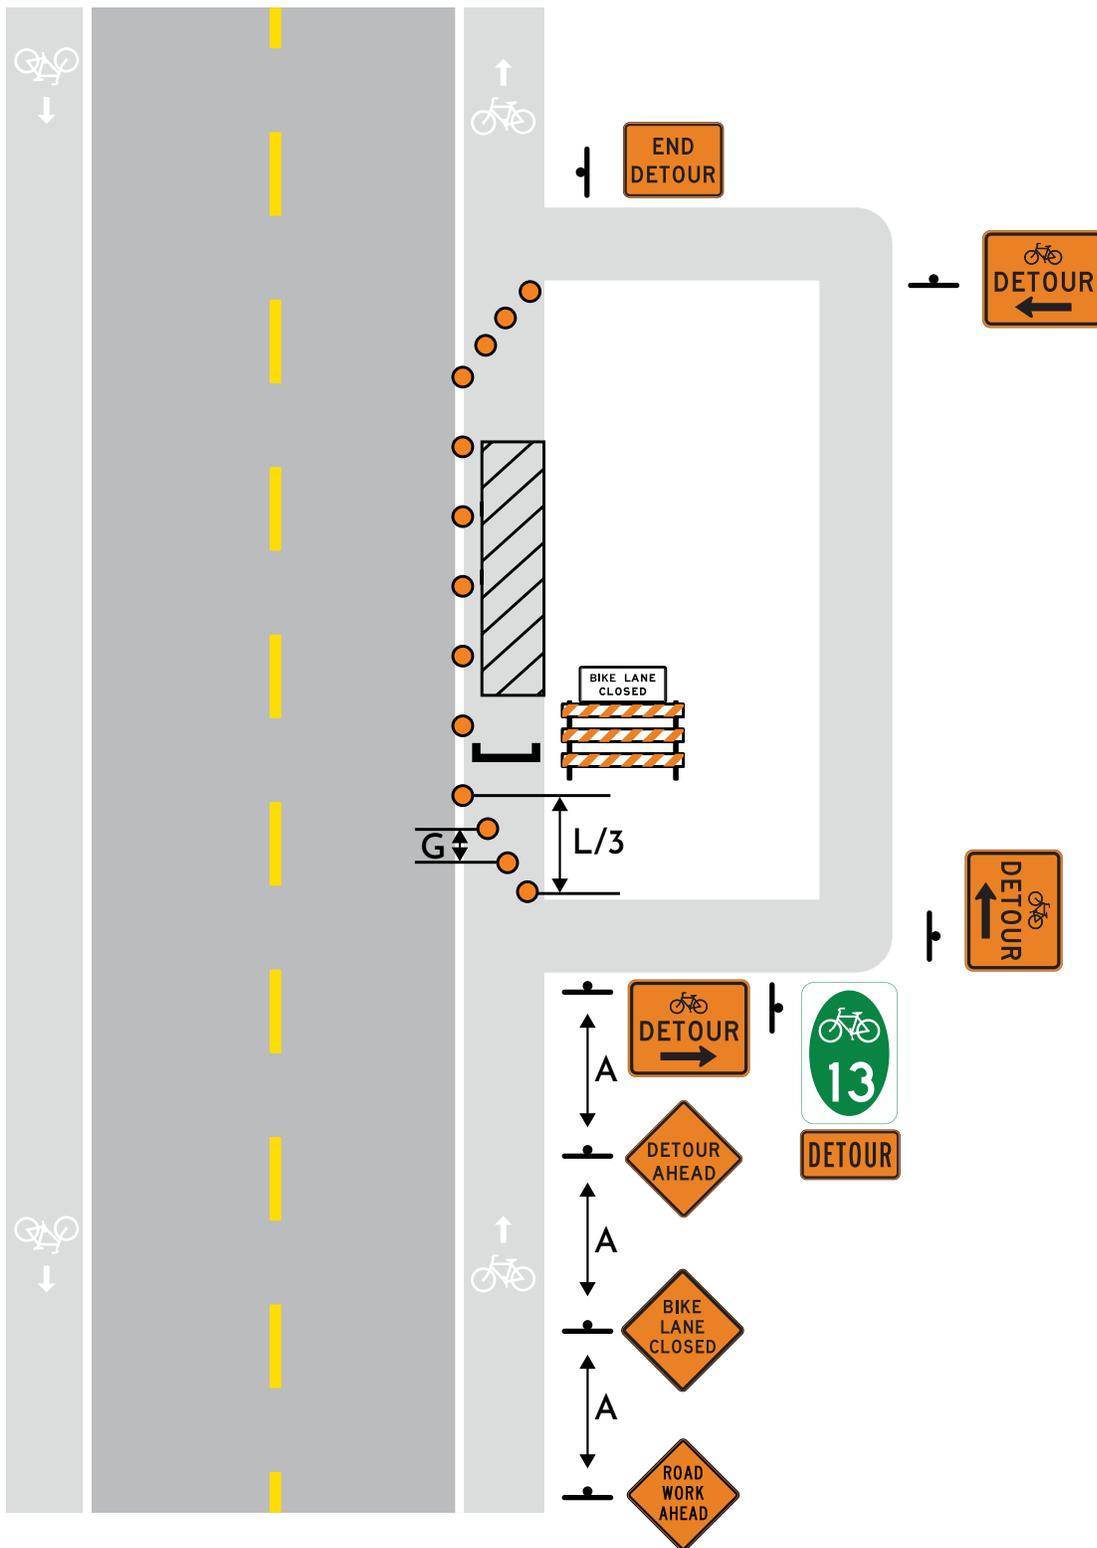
Plan view of typical detour sign layout. Refer to MN MUTCD Park 6K for applicable sign distances
